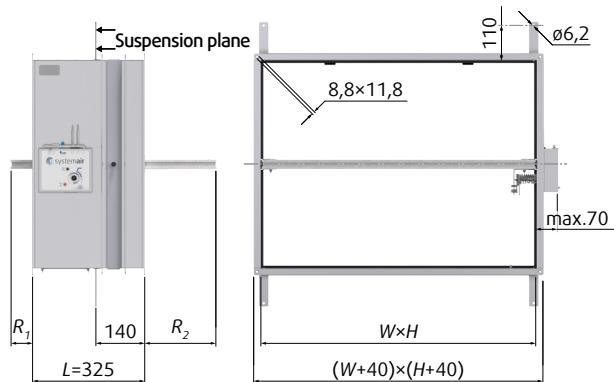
Dimensions of the manual rectangular fire damper PKIS3G - nominal dimensions 100×100 mm to 800×600 mm and PKIS3GA - nominal dimensions 850×100 to 1200×300 mm
